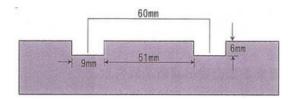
Cross-section of a road surface that has undergone grooving
